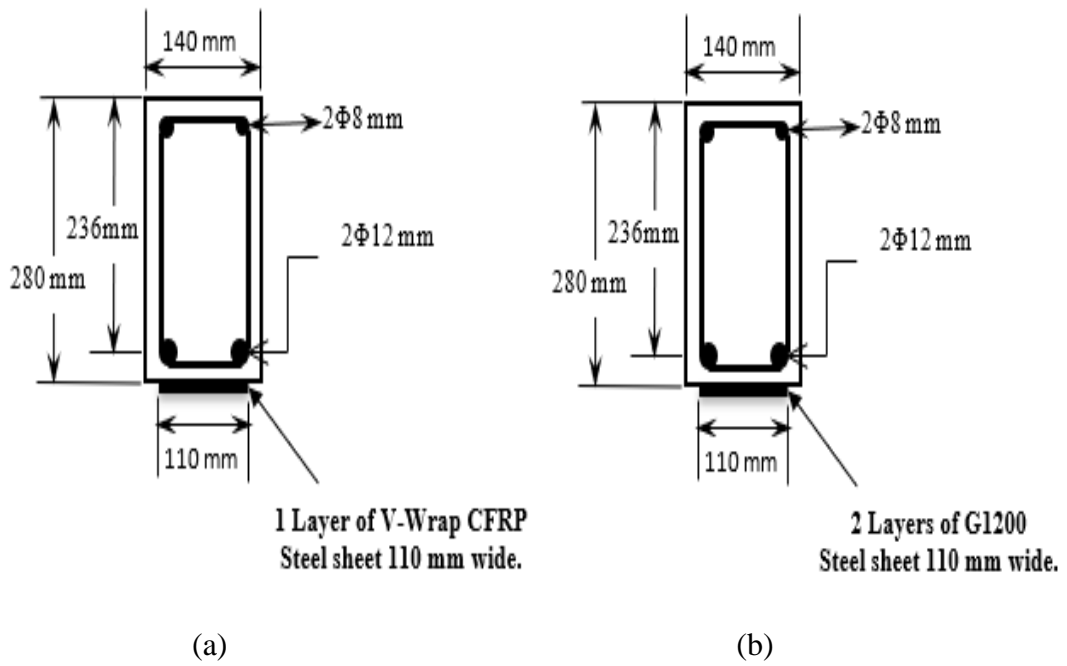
(a) Cross section of CFRP strengthened RC beam, (b) Cross section of GSM strengthened RC beam
